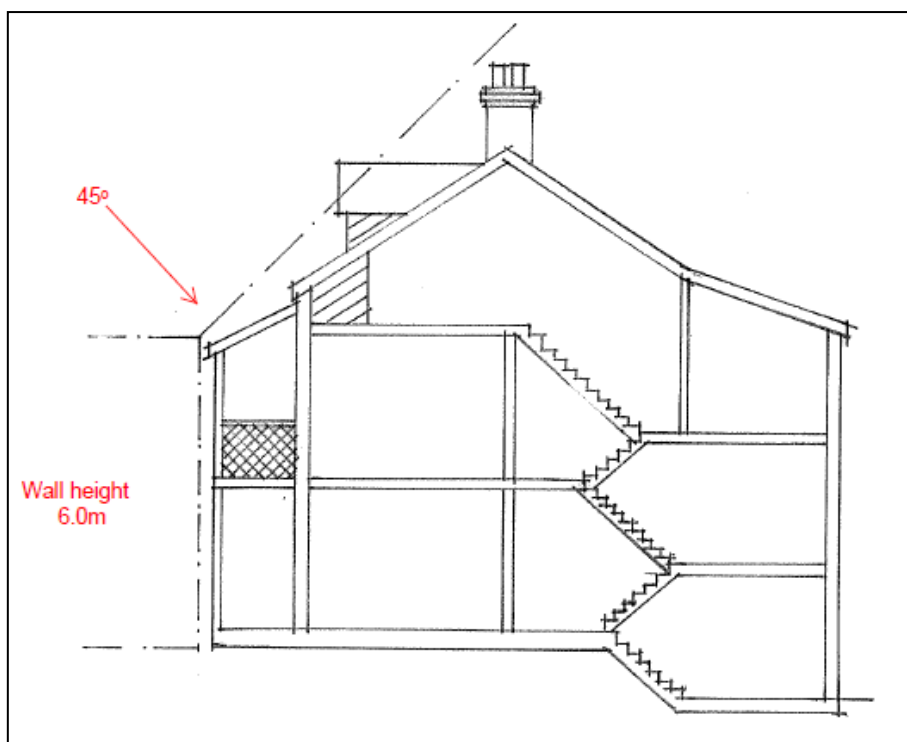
Building envelope – 6.0m wall height – two storeys, similar to the scale of a two storey Victorian terrace.
